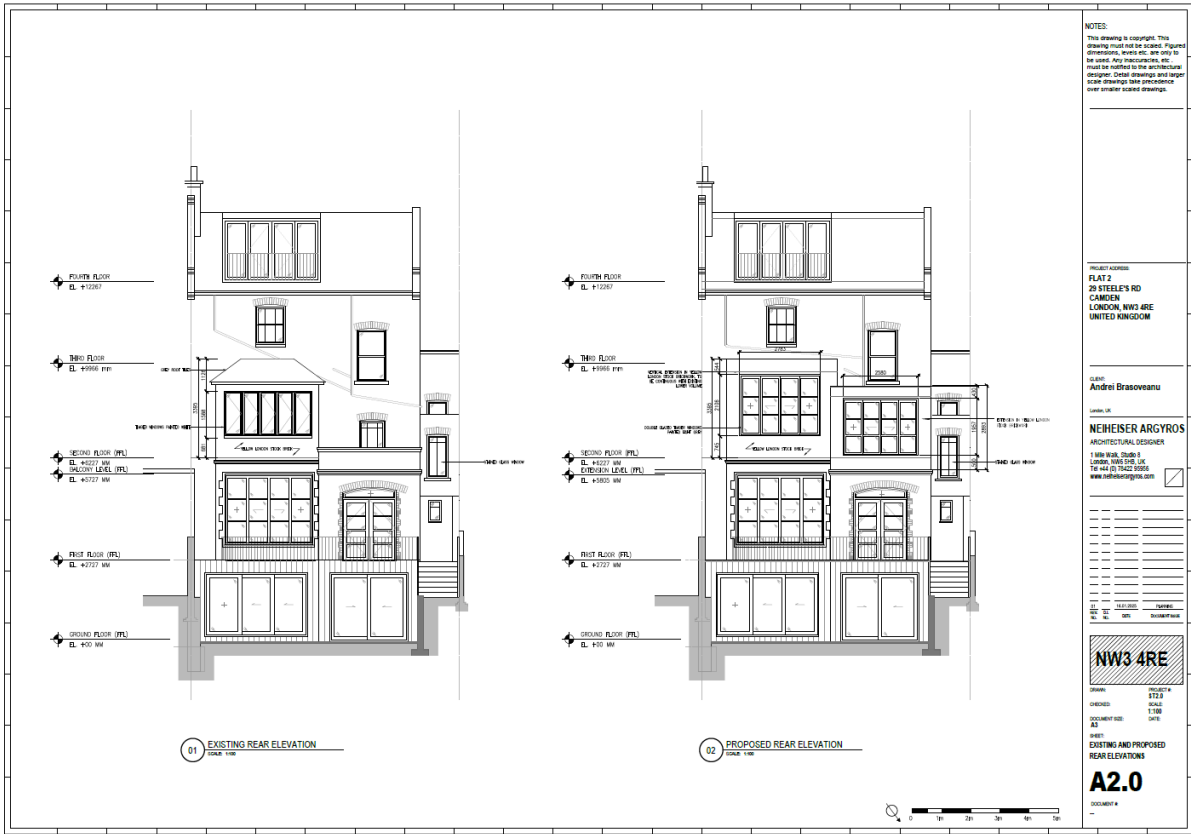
Existing and proposed rear elevation (Source: submitted documents)
